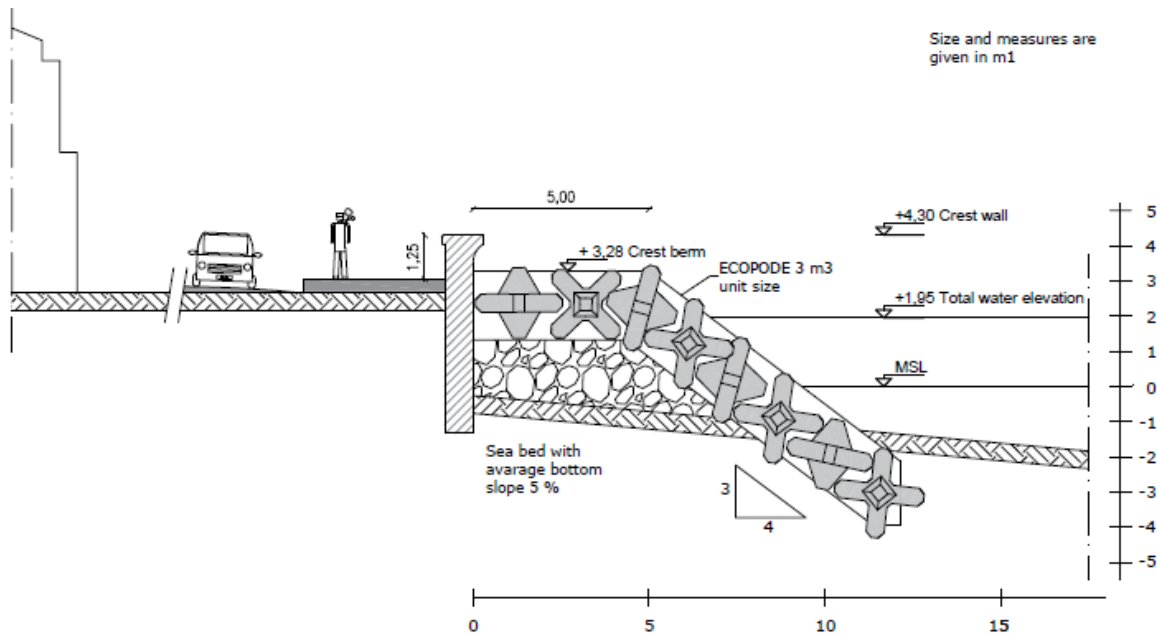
Detailed design for section 3.1, 3.8, 4.1, 4.2 and 4.3
